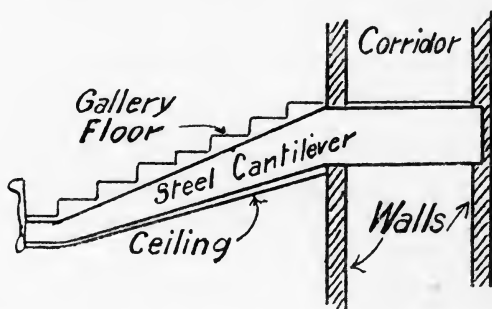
This shows how the galleries in modern public buildings are supported from the walls by means of cantilevers.
